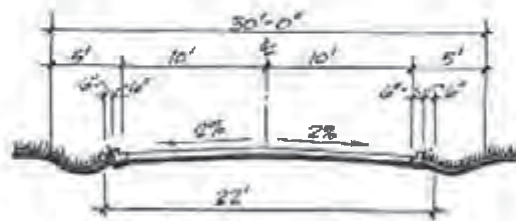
Local Single Loaded Street Local Unloaded Street
